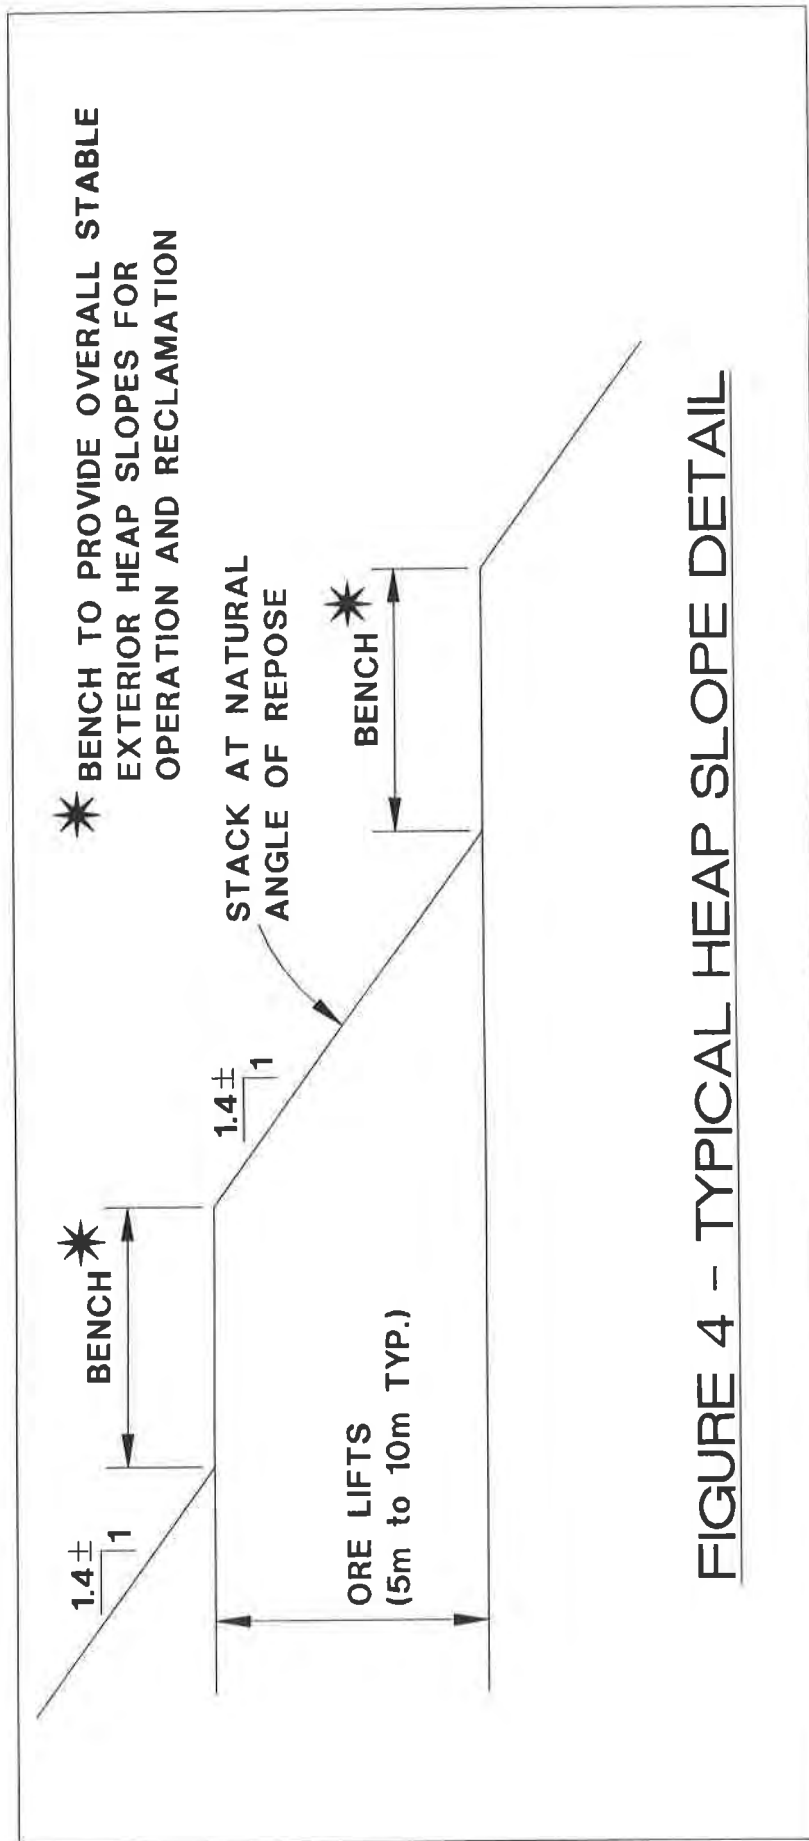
TYPICAL HEAP SLOPE DETAIL
